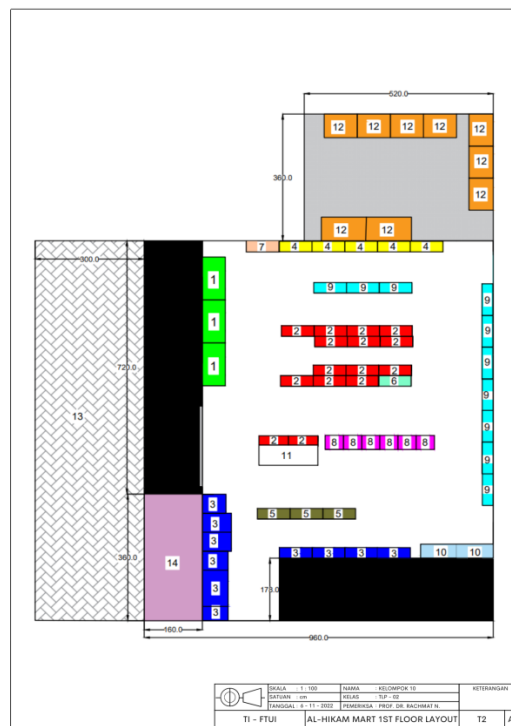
Proposed firstfloor layout improvements in 2D with AutoCAD
